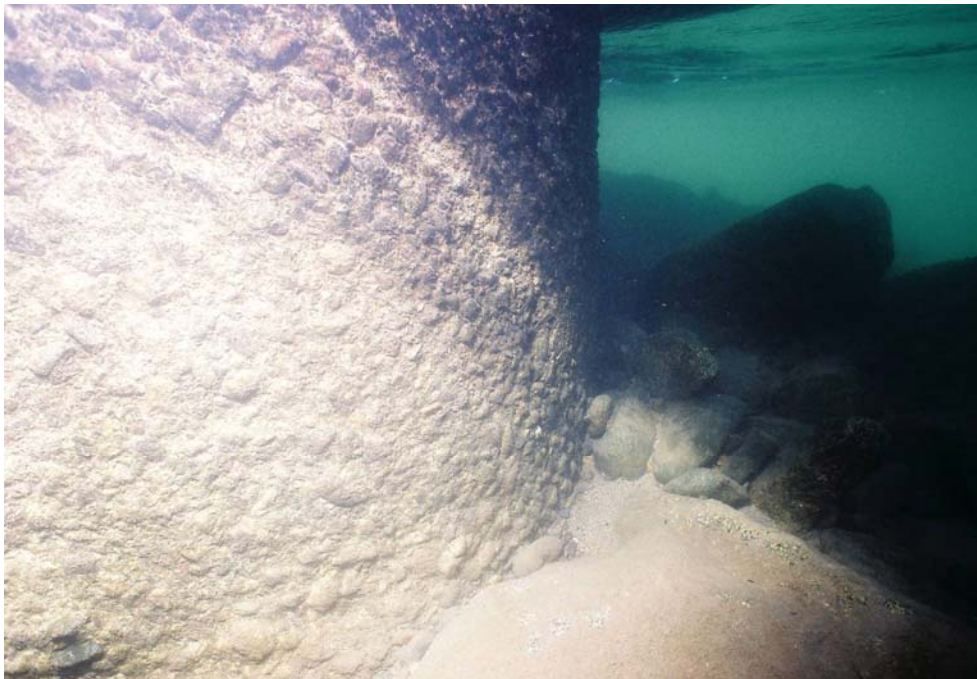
Pier 5, Downstream End - Note the good condition of the submerged concrete and the rock, sand and silt bottom composition.
